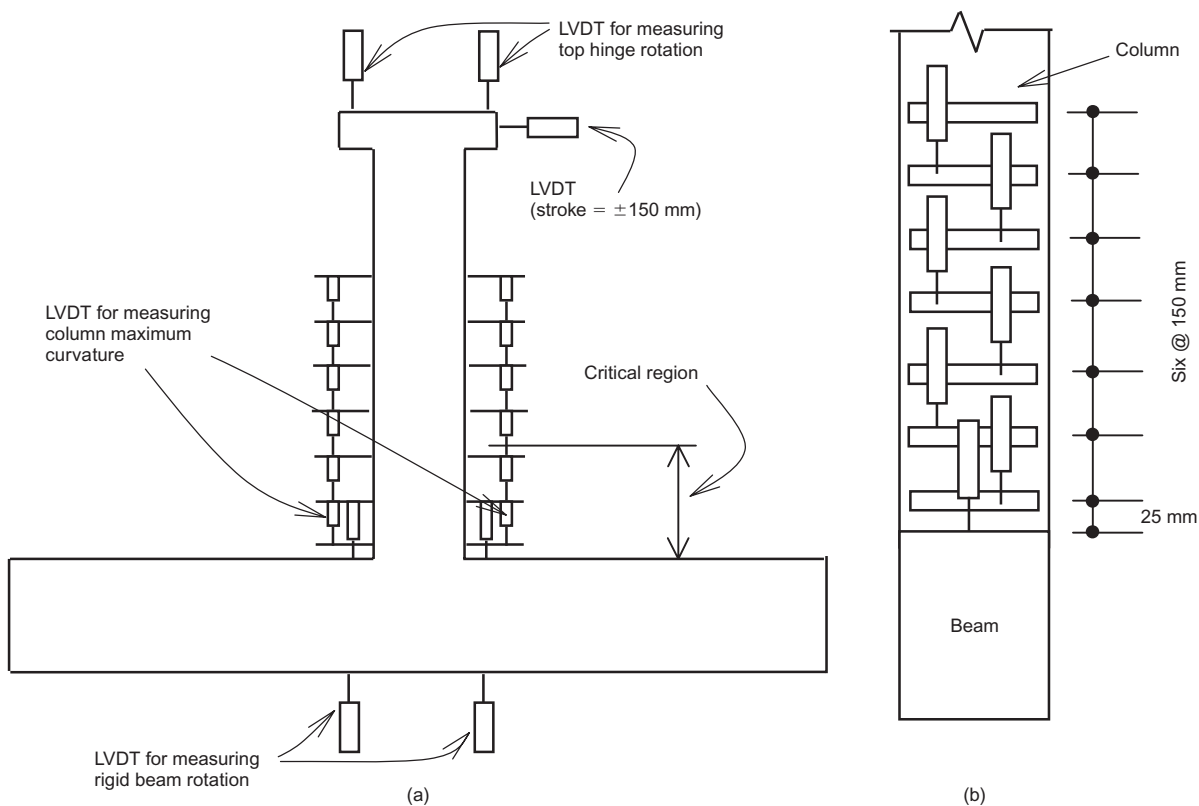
LVDT arrangement: (a) front elevation; (b) side elevation
